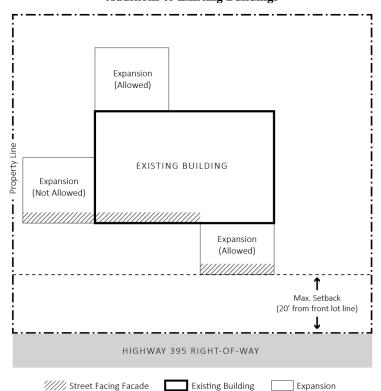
Applicability of Maximum Setback Standard for Expansions or Additions to Existing Buildings
